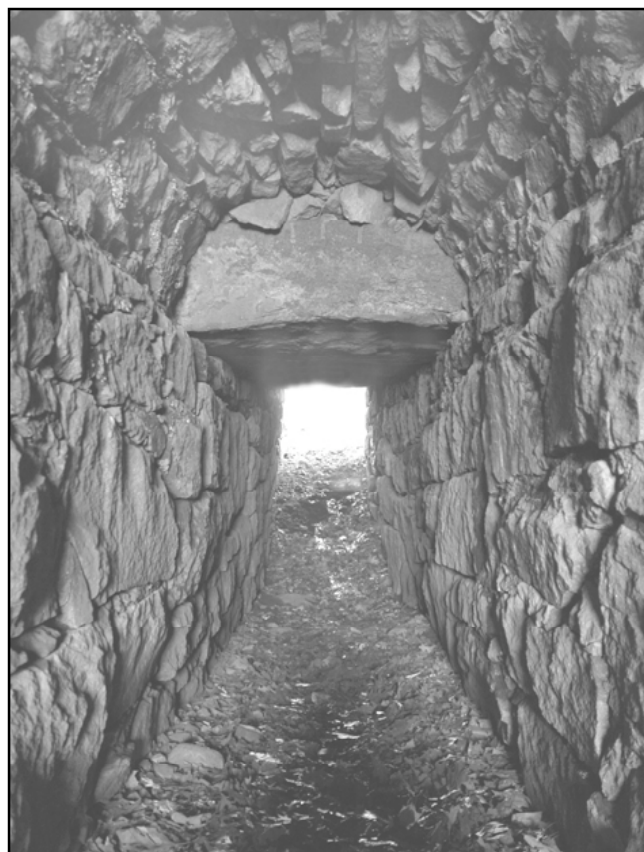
View looking south showing cattle pass interior, transition from northern arch section to southern box culvert section.
